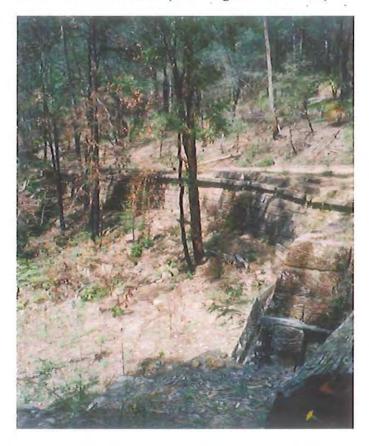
The road formation and retaining wall often acts as a fire break, impeding the spread of fire uphill. (Photo: Ingereth Macfarlane)
